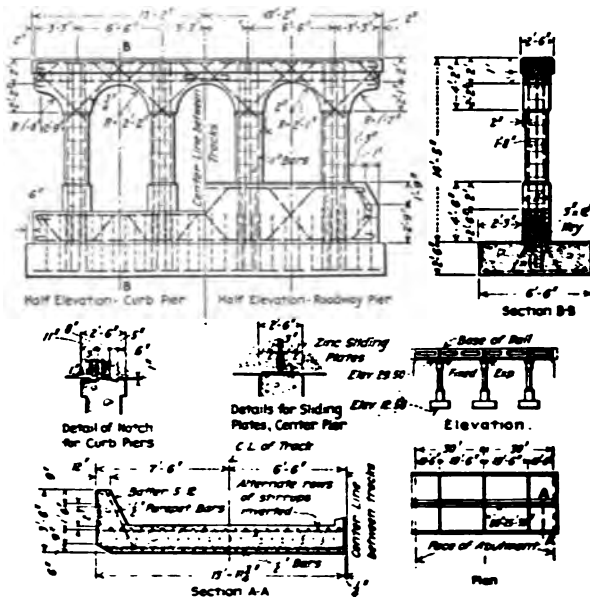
Details of Mozart Street subway, Bloomington & St. Paul Railway.
